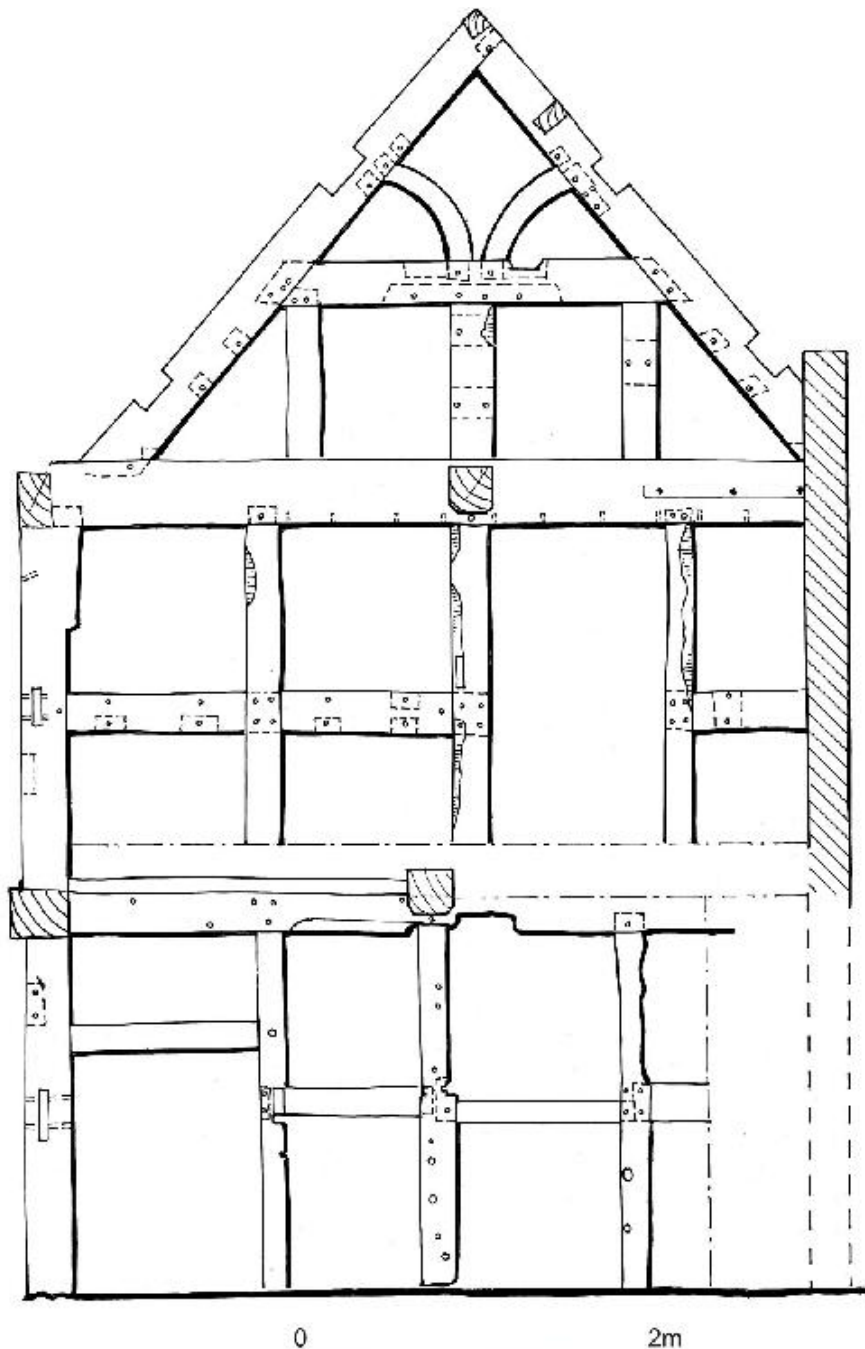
Detailed survey of the inner face of the southern end frame of 64–66 Widemarsh Street showing the extent of re-used timbers used in its construction
